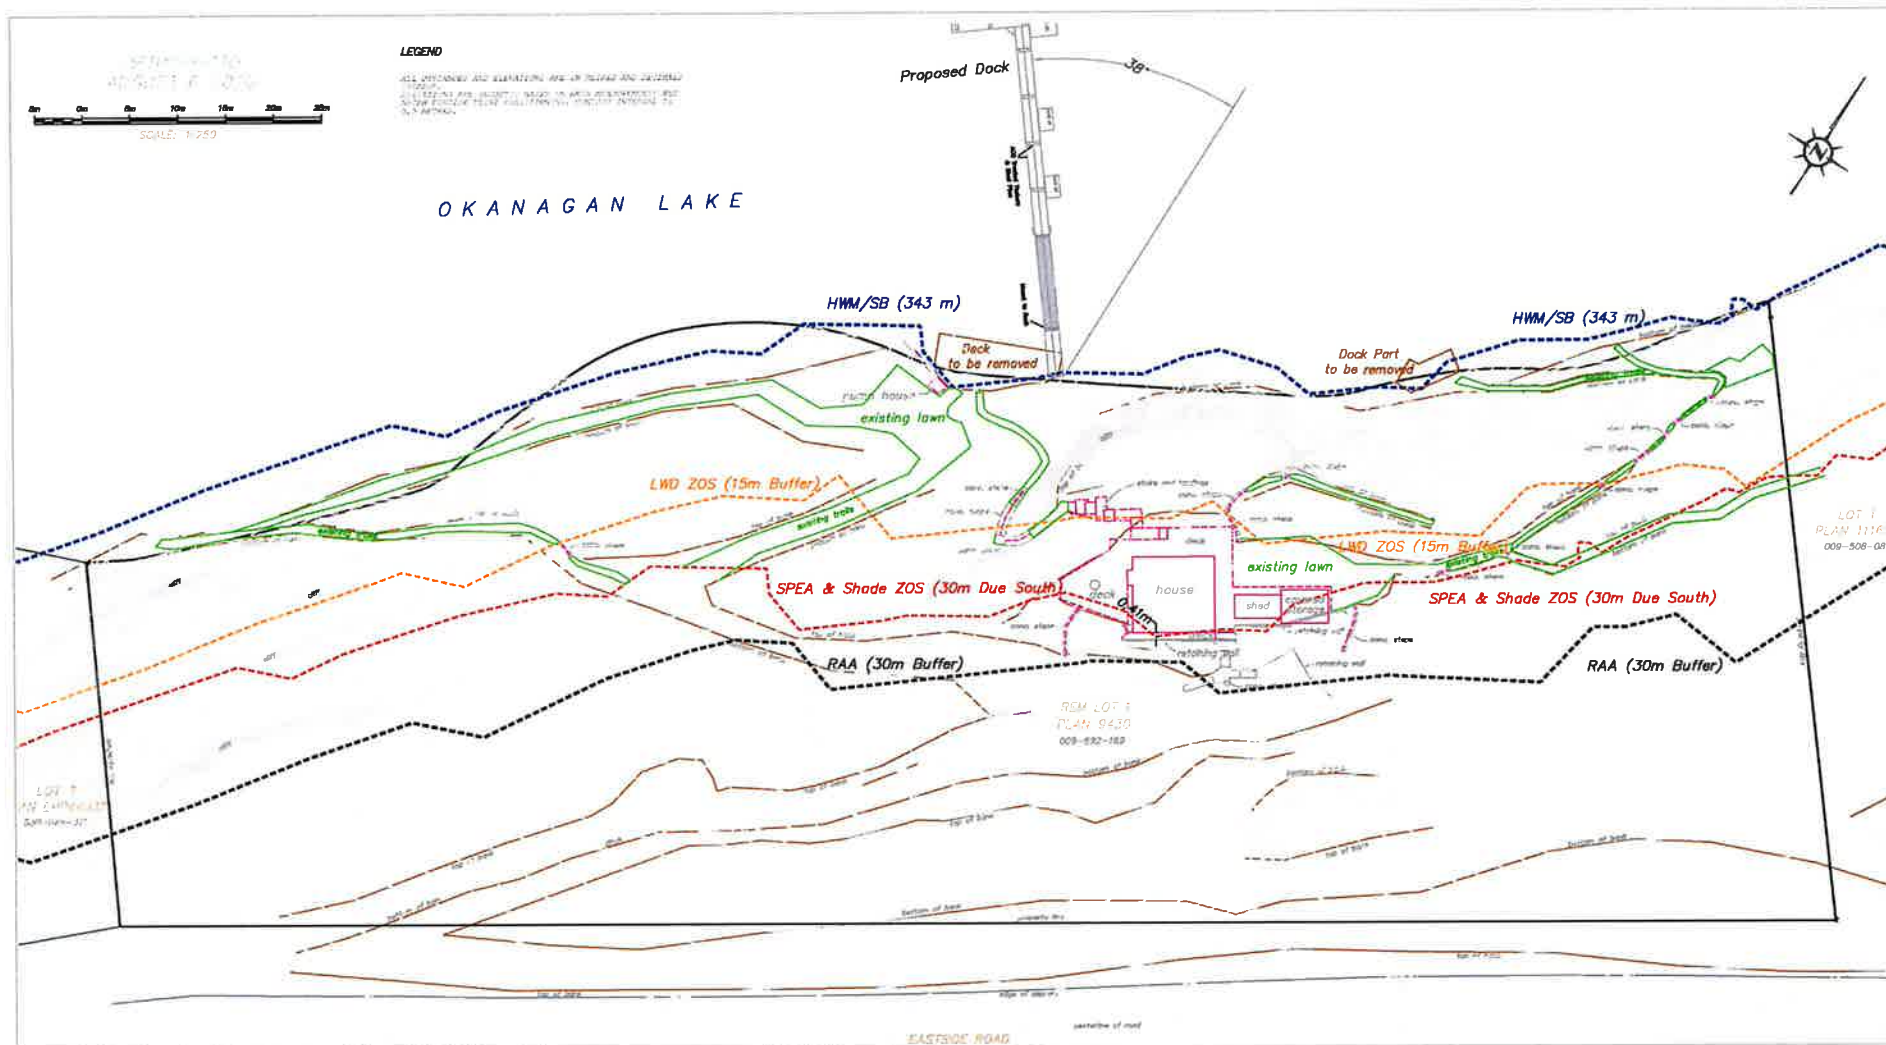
Site plan with existing structures, trails and RAPR determined SPEA (Aerial Image removed for clarity).
